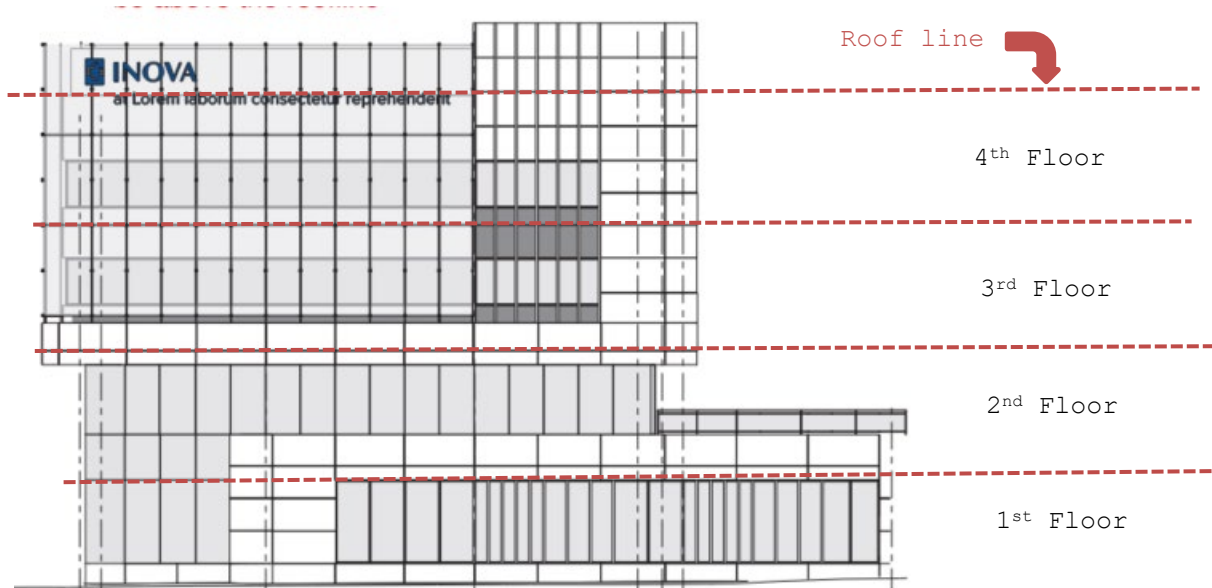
Elevation of the Healthplex showing the relative location of the building floors, roofline, and proposed roof sign.
